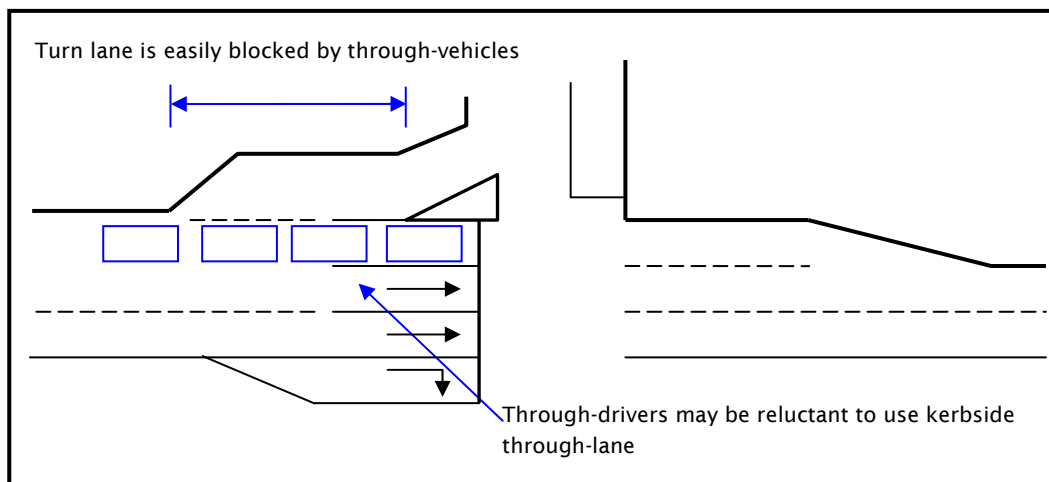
Approach alignment of Mt Eden Road/Balmoral Road Intersection
